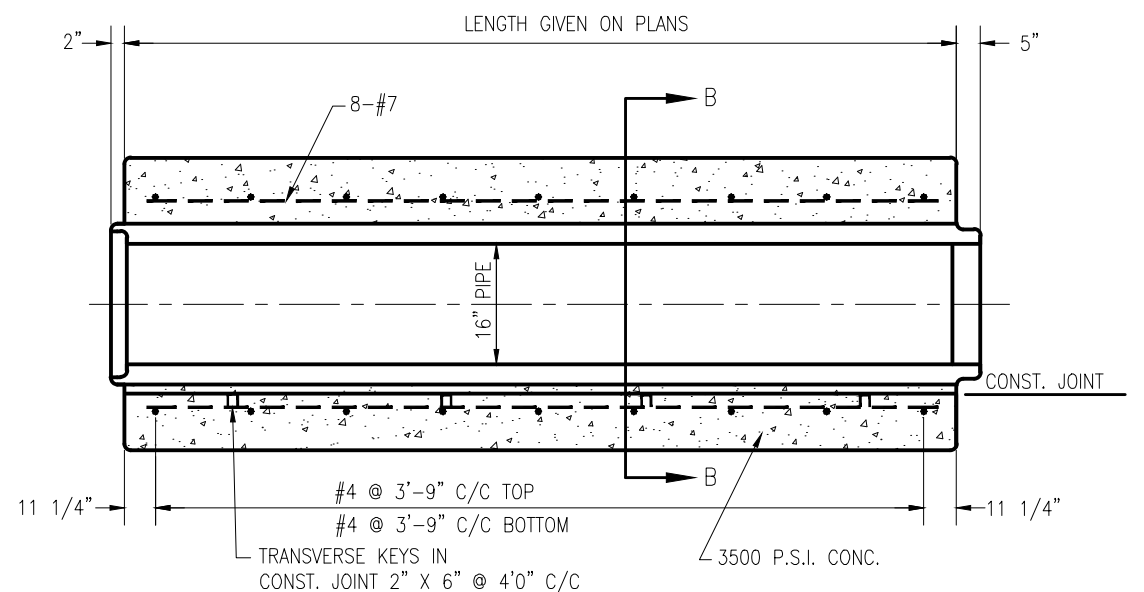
DETAILS ARE TYPICAL FOR WATER MAIN CONSTRUCTED IN CASING PIPE.
